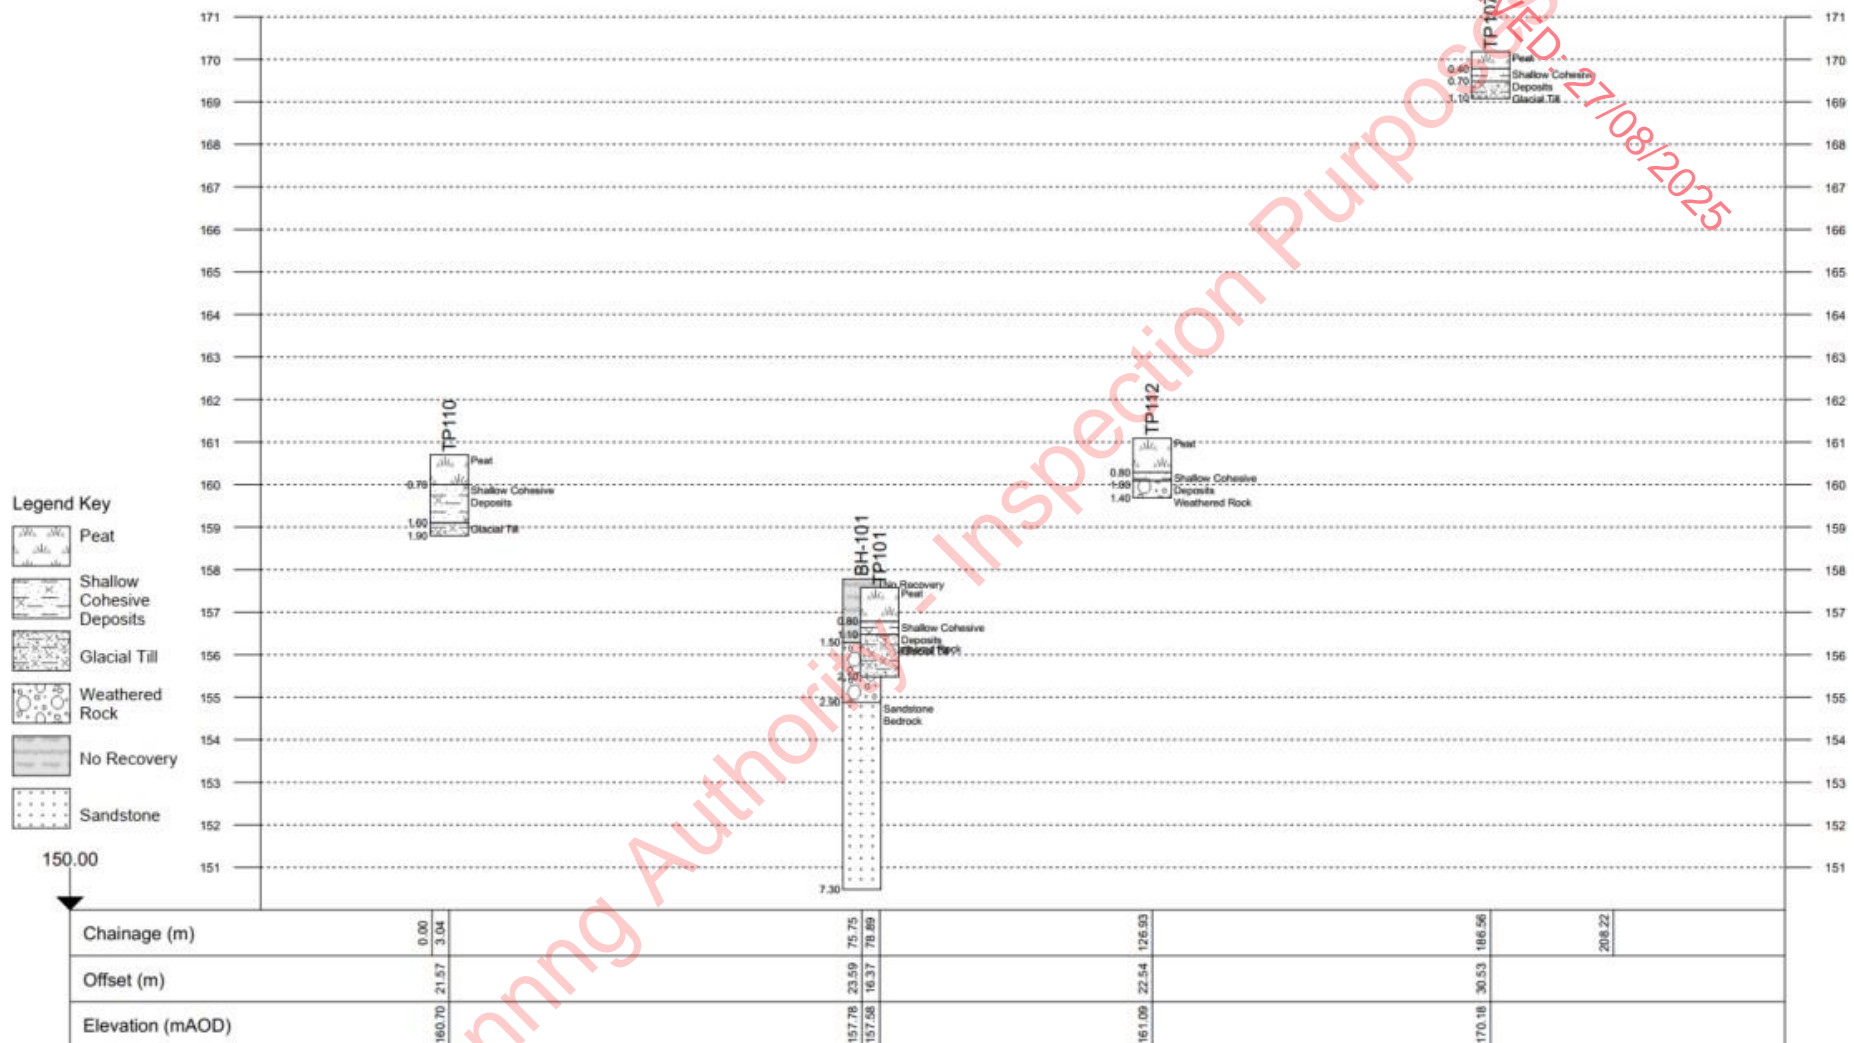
WTG1 and Borrow Pit 2 geotechnical cross-section
